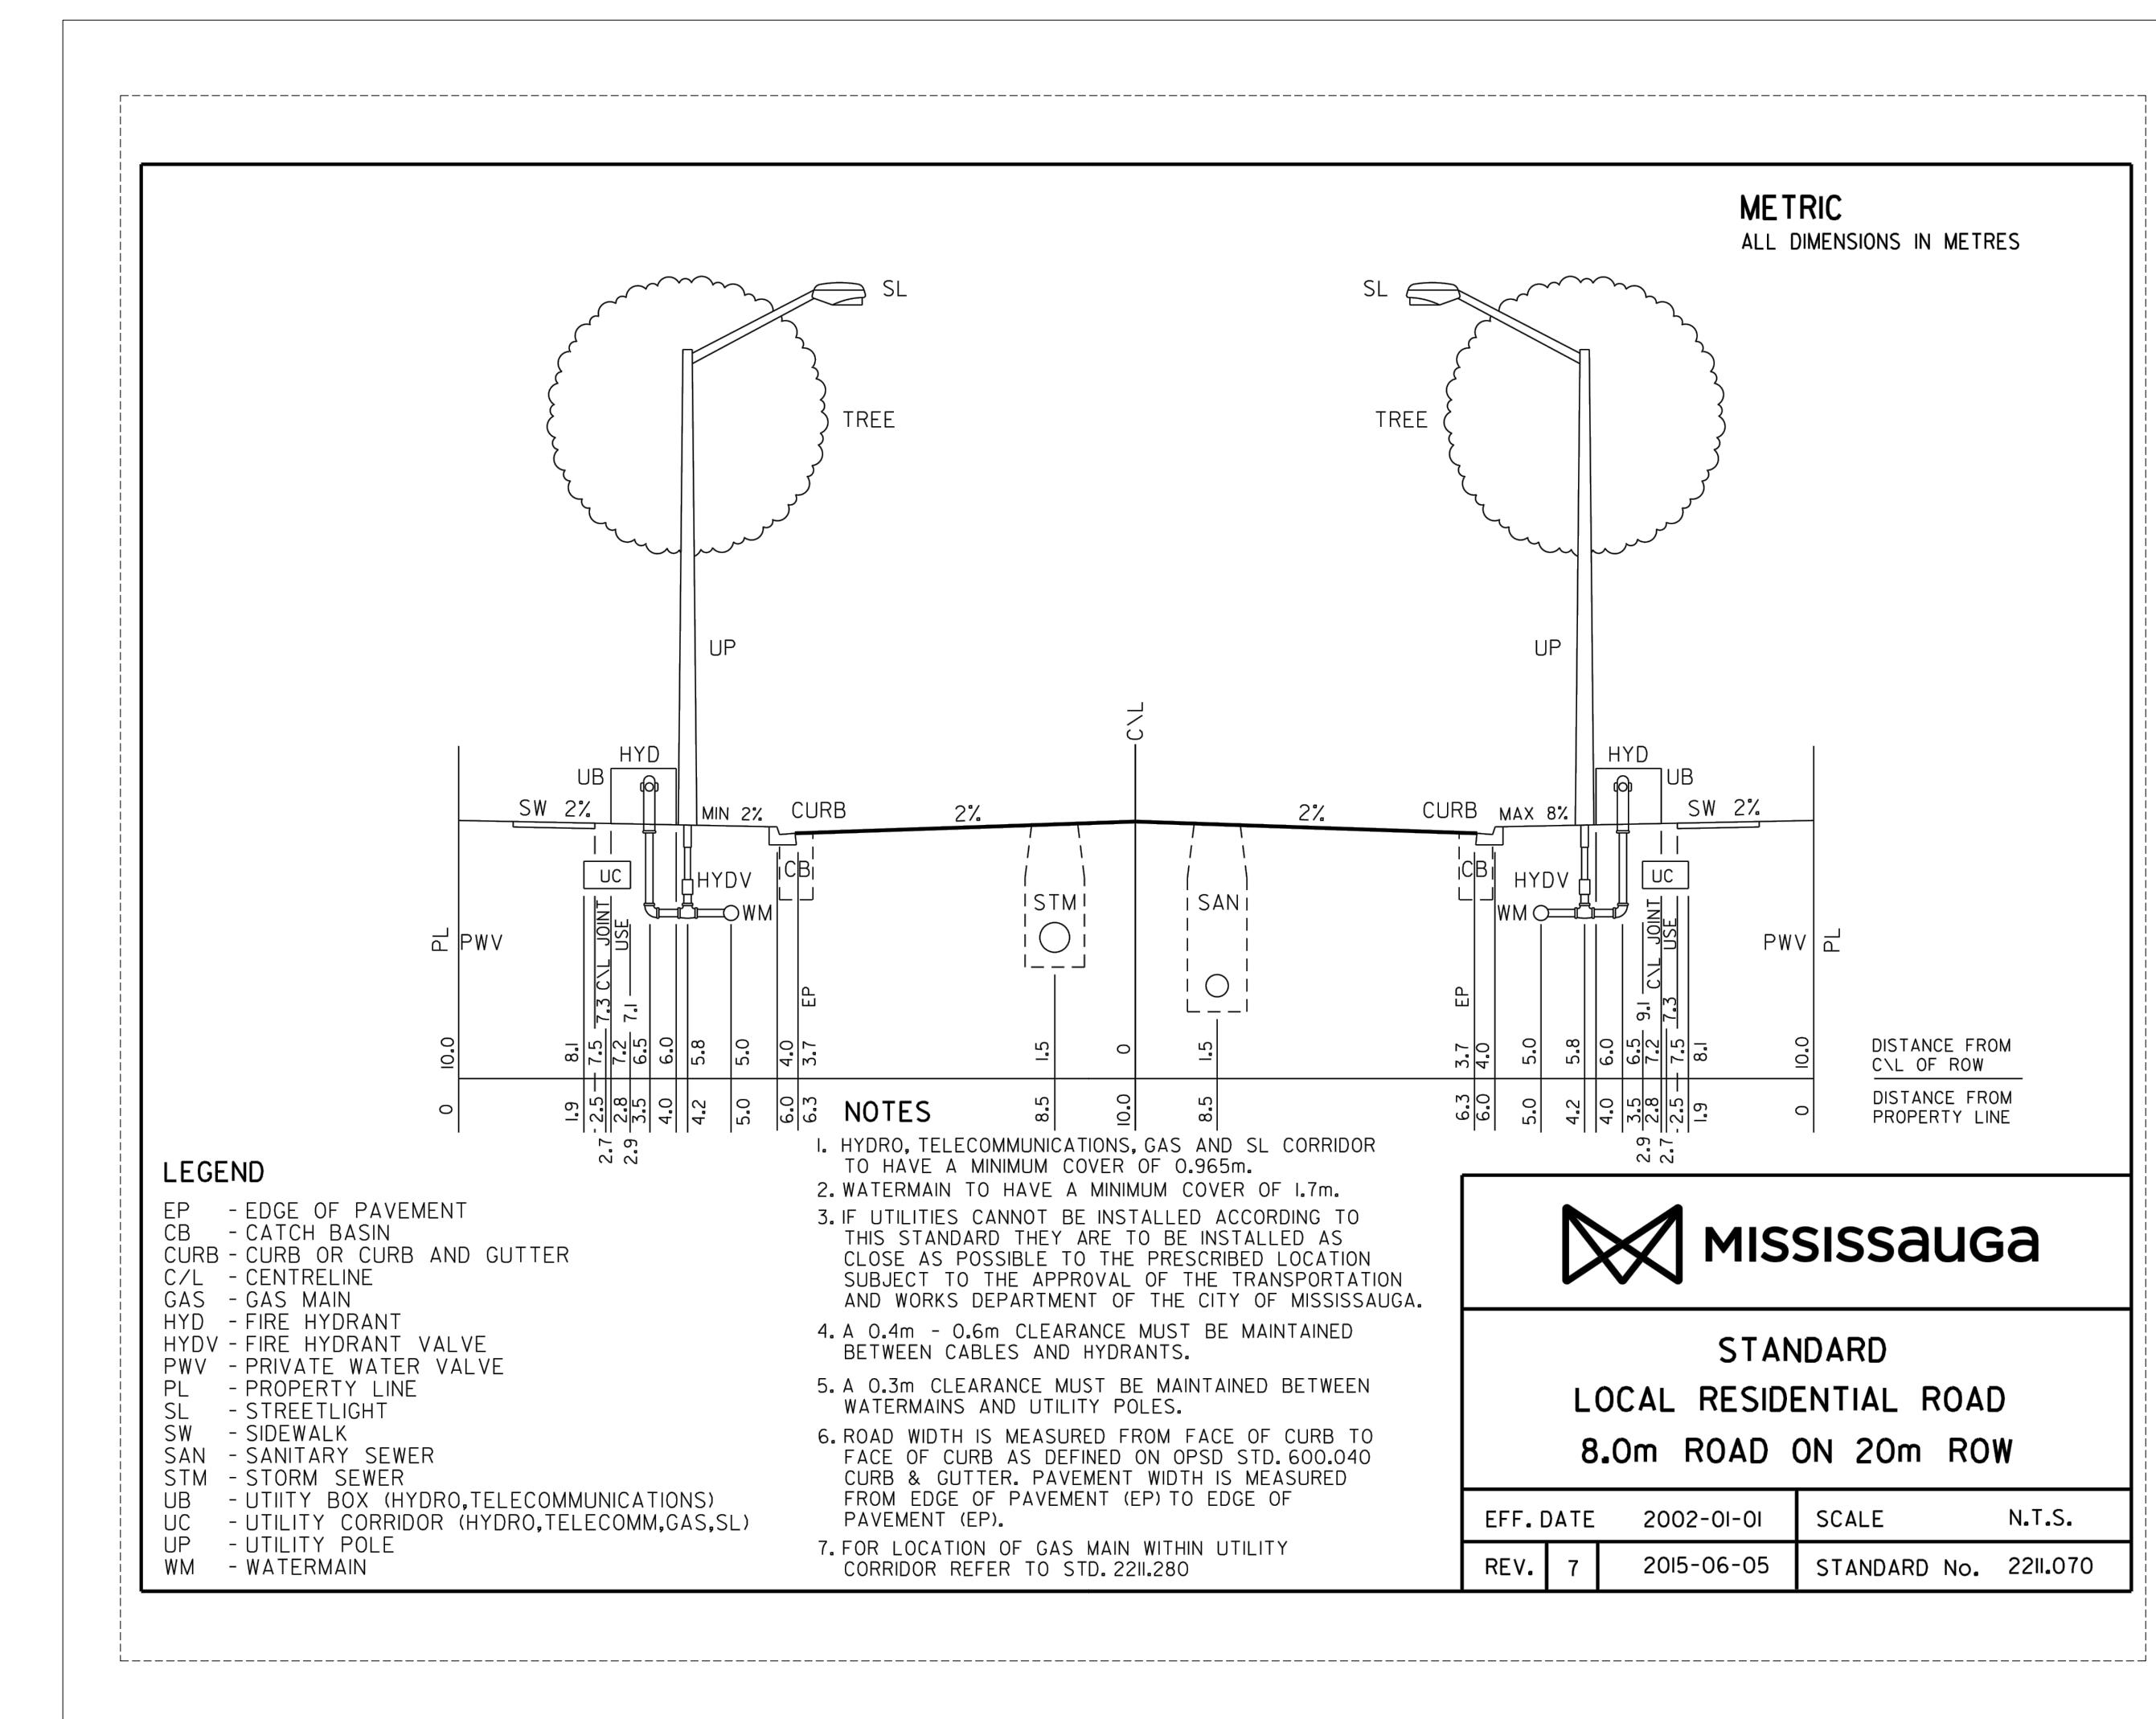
PROPOSED INTERNAL ROADWAY CROSS-SECTIONS
